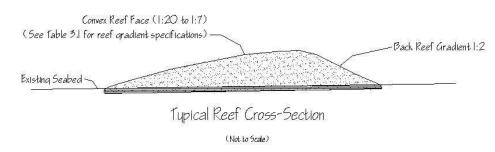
A typical reef cross-section incorporating a convex reef profile.
